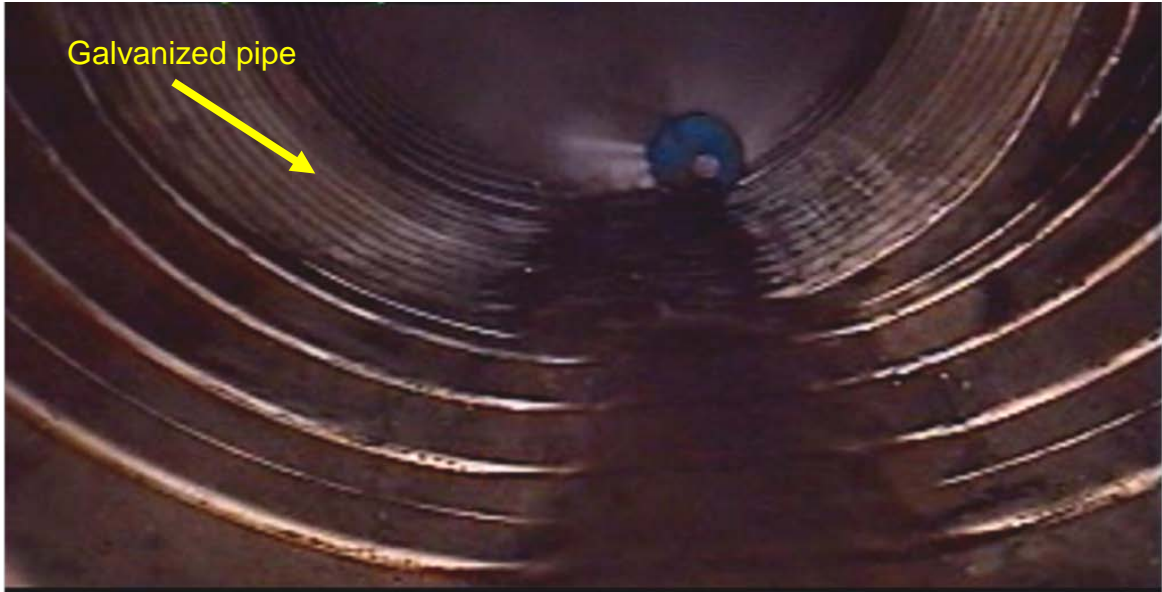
Snap shot of a video from inside a pipe that shows plain corrugated galvanized pipe is joining the segments of SRAP.
